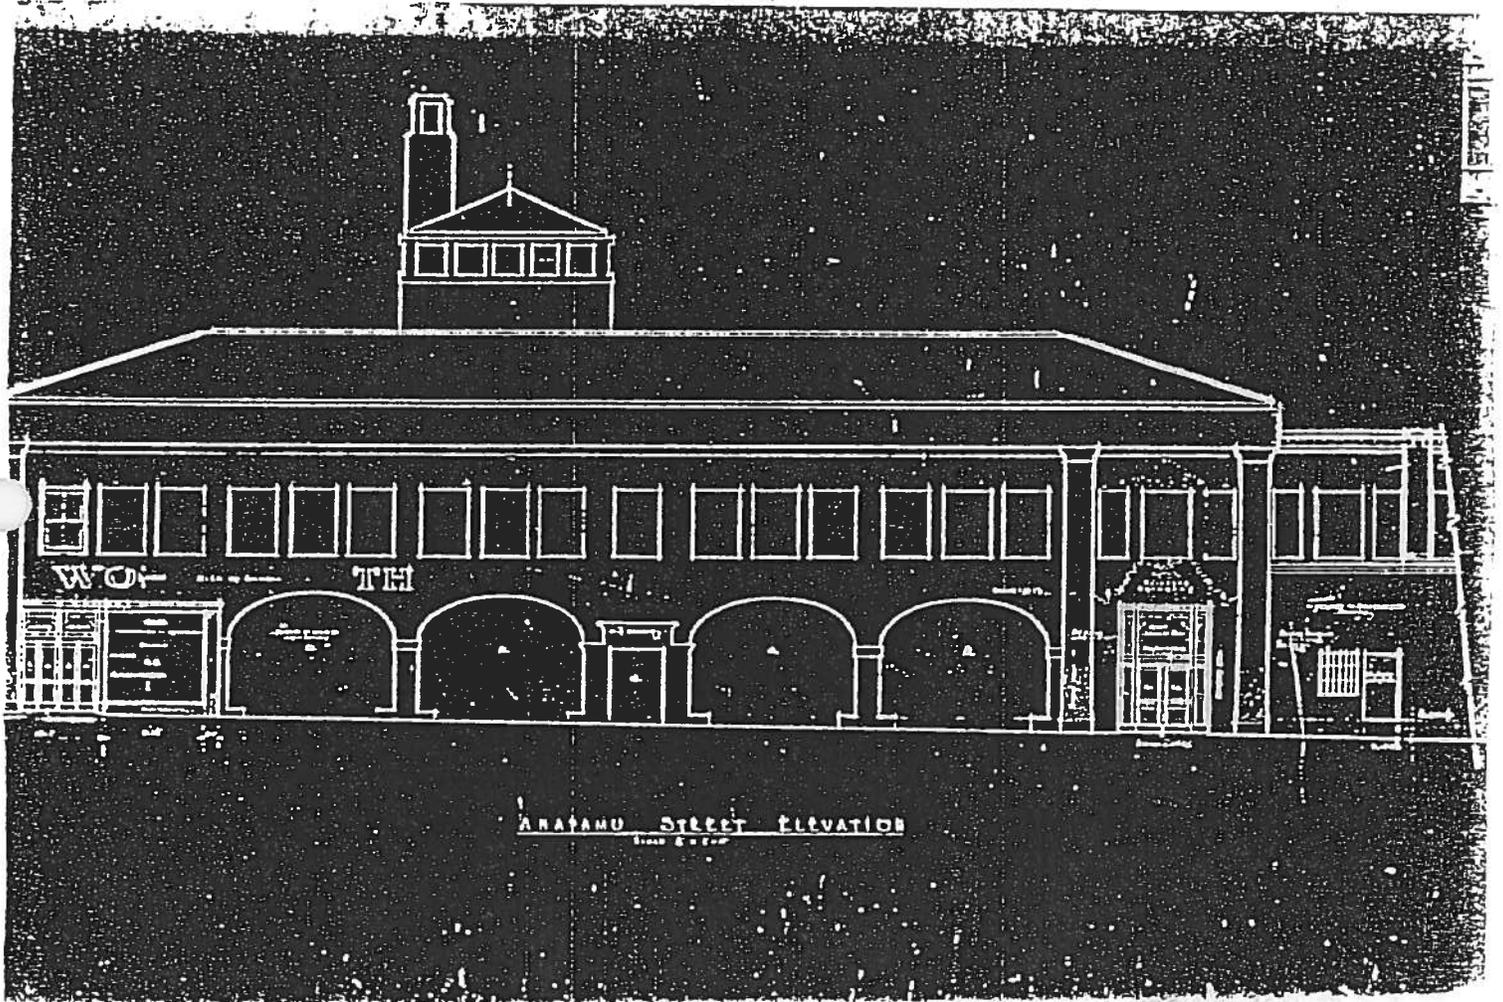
Woolworth's Architectural Plan 1949-Anapamu Street elevation
